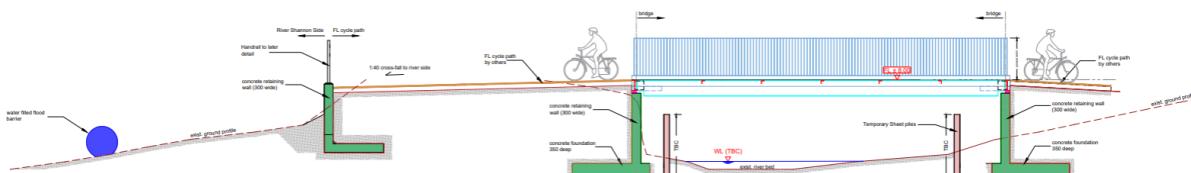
Section of retaining wall for proposed Ramp and Abutment walls for proposed Bridge 5 (refer to drawing RHA-XX-DR-S-SP0052)
